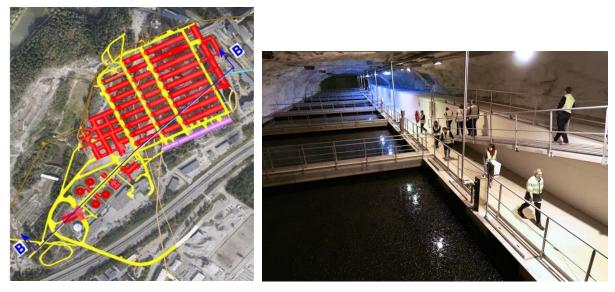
Underground waste water treatment facility in Helsinki (Rockplan, 2020)
